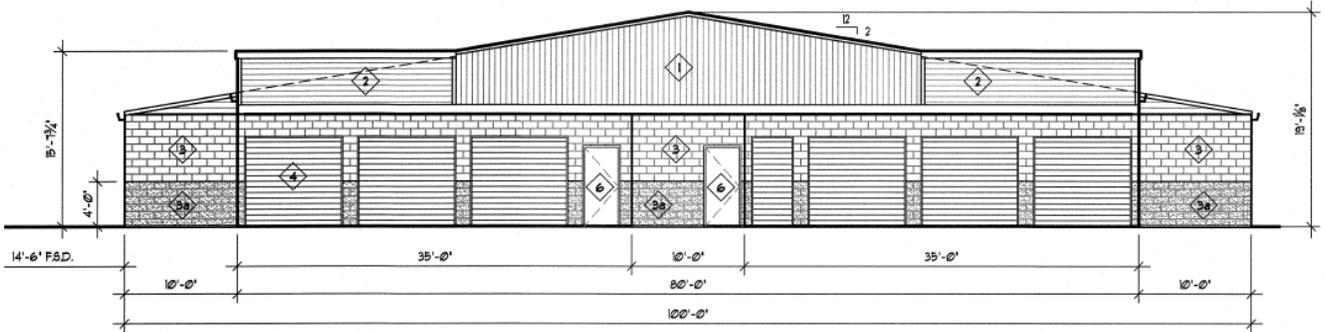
Building #7 and 10 Storage Buildings - View from SR 410; North Elevation
